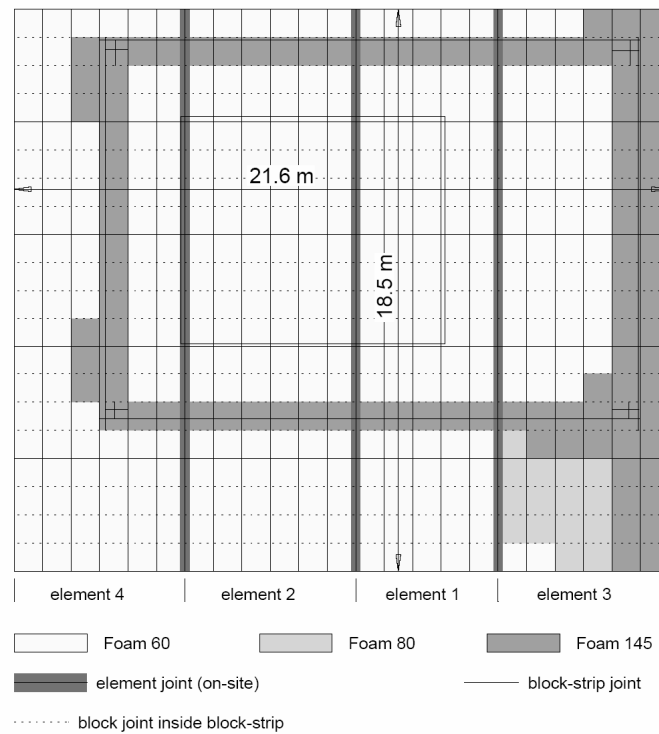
Plan view of sandwich roof structure of Novartis campus main gate building with internal web grid, core density distribution, block, block-strip and element arrangement (Keller et al. 2008).
